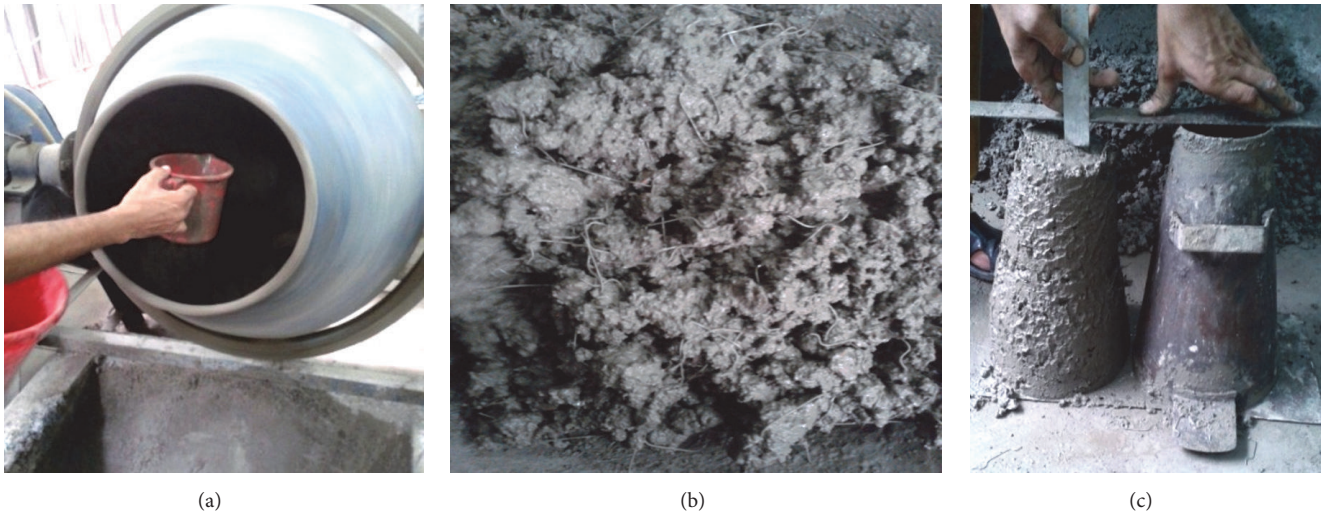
(a) Concrete mixing, (b) after mixing, and (c) slump test.
